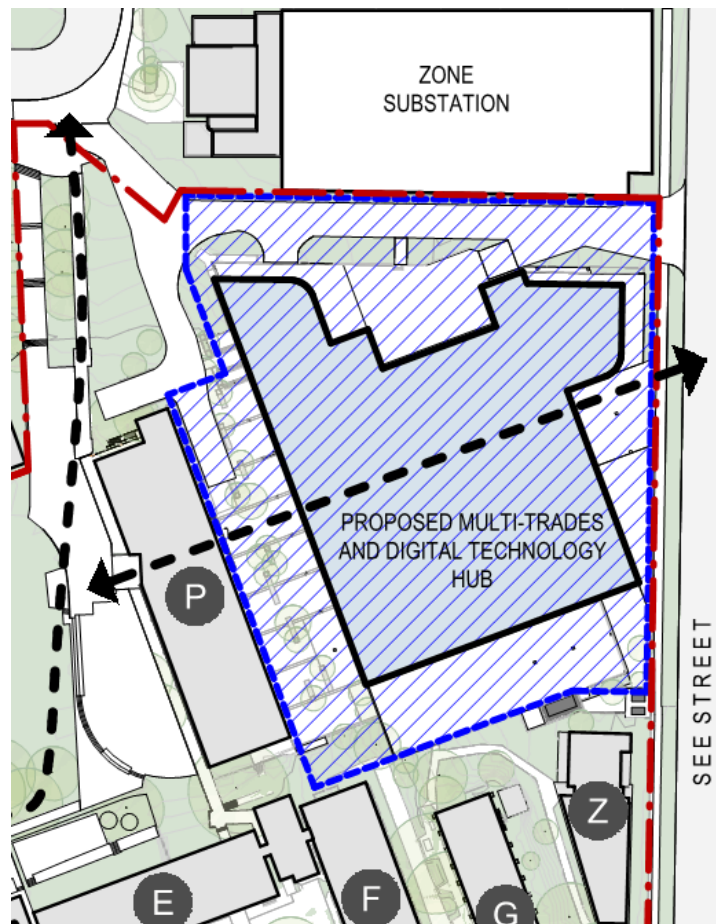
Proposed New Multi-Trades and Digital Technology Hub Building
